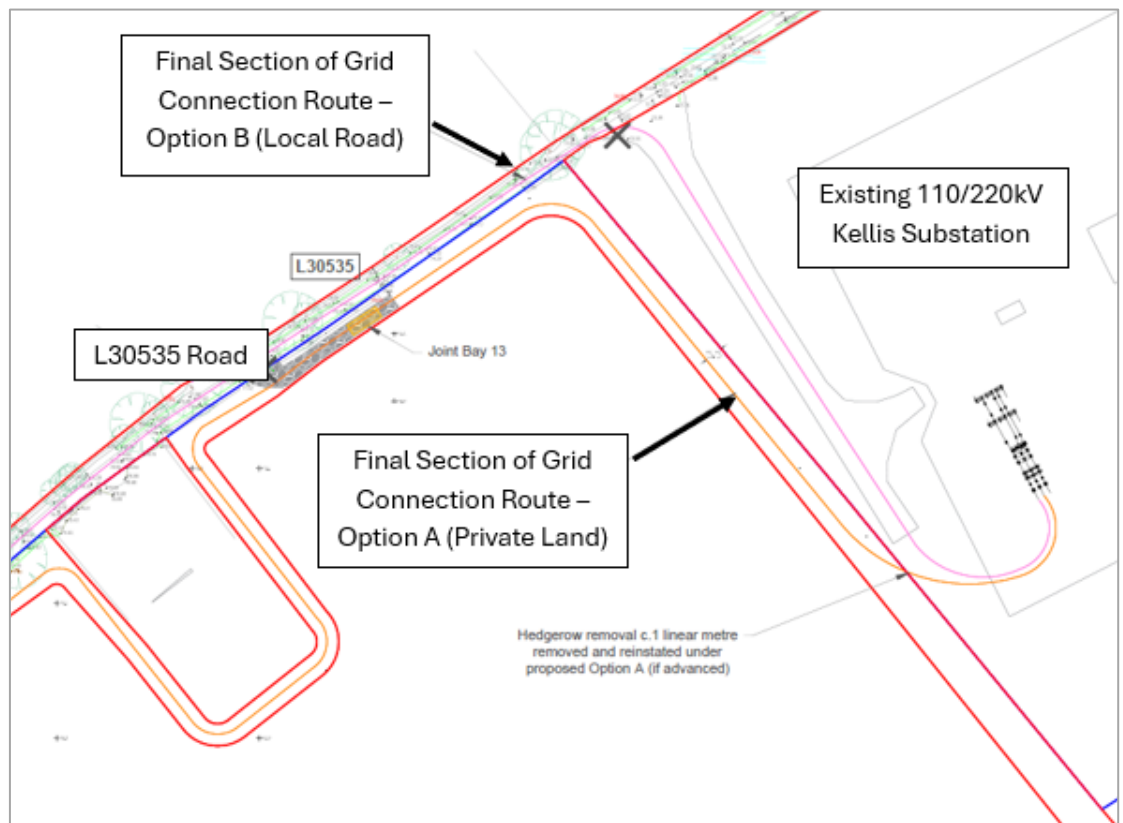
Final Underground Cabling Options on Public Road / Private Lands
